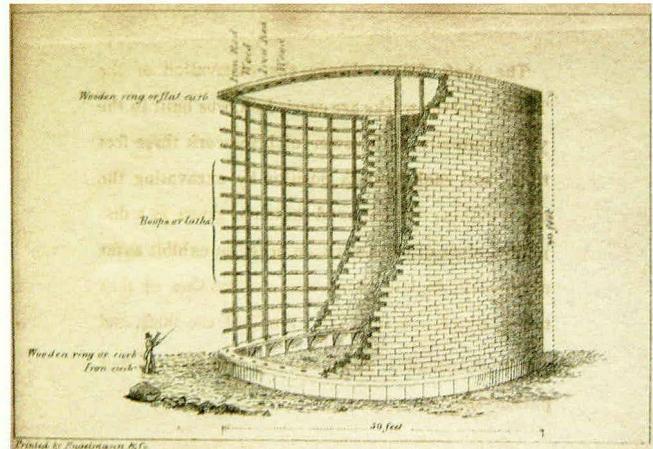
The brick shaft and its timber framing built on the south bank of the Thames, 1825. [Foto: Ironbridge Gorge Museum Trust]<sup>9</sup>
